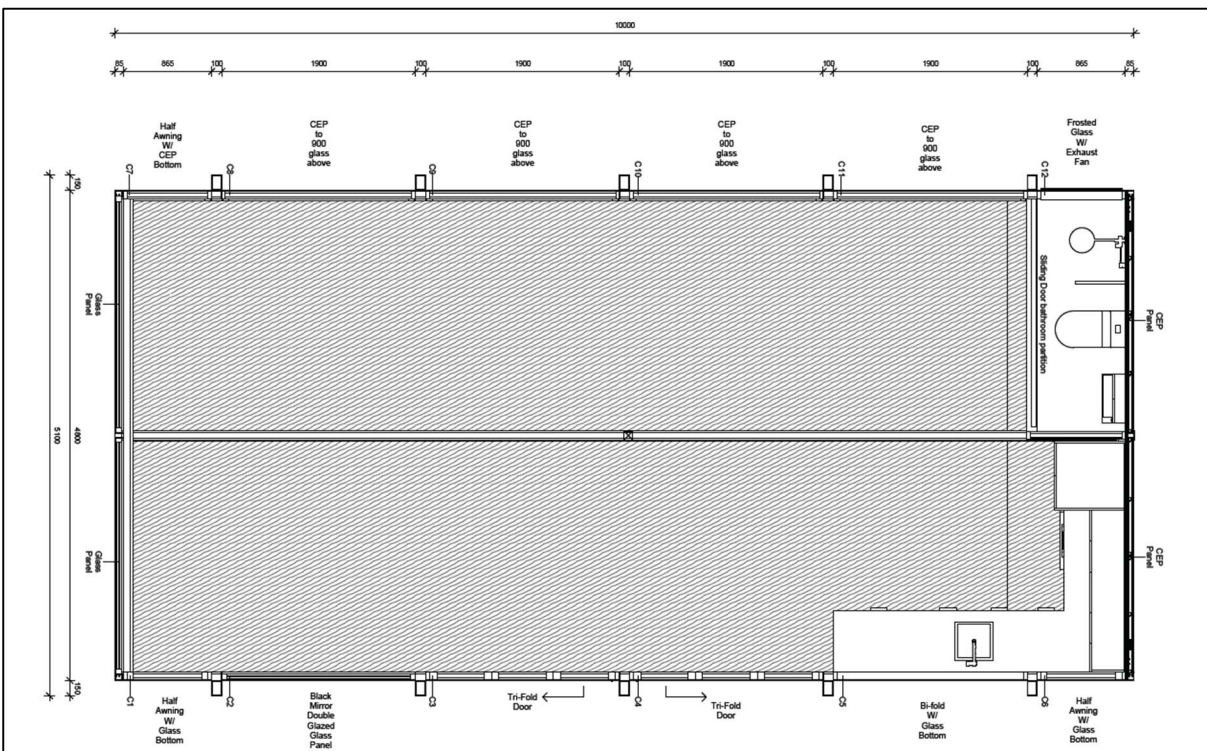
Proposed Floor Plan (Source: Elsewhere Pods, 2025)
